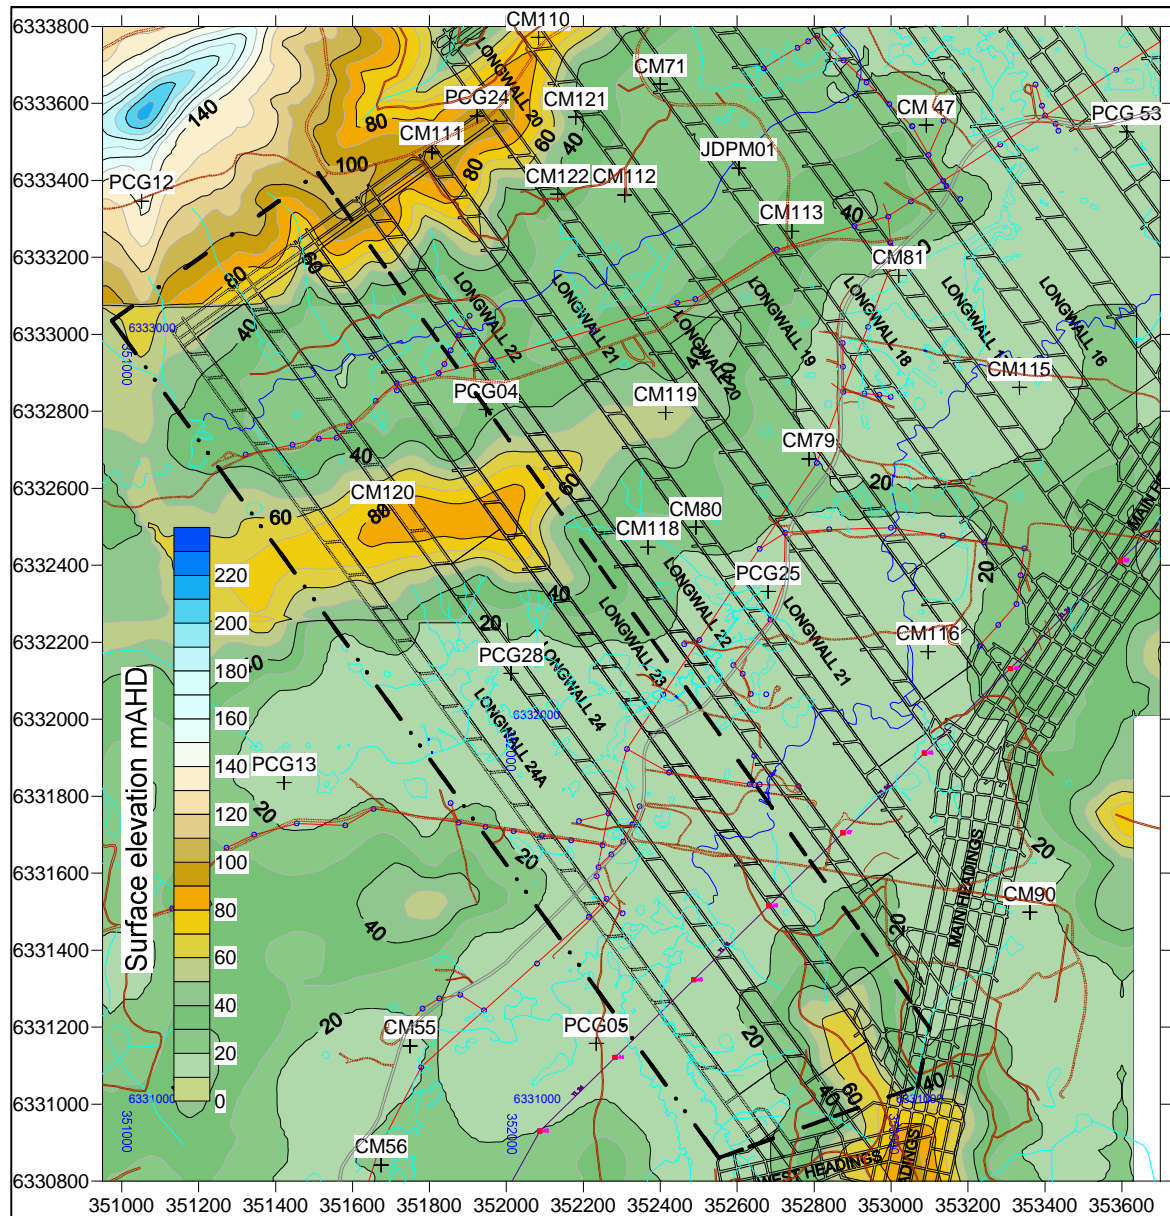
Mine plan, surface topography, drainage lines, boreholes used in determining conglomerate thickness and the location of surface infrastructure – study area shown with dash/double dot line. Detailed plans of infrastructure included in an appendix.
